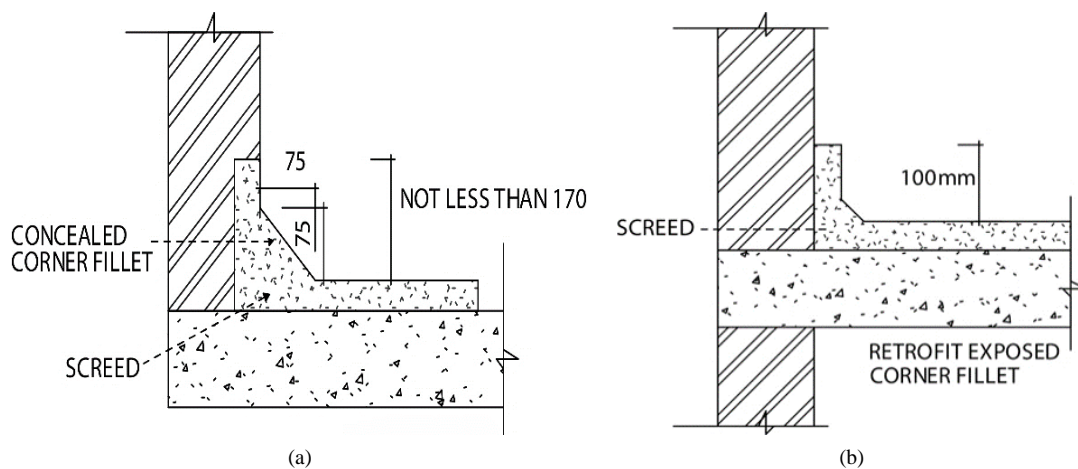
(a) Concealed Fillet Retrofit, (b) Exposed Fillet Retrofit
